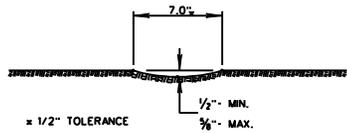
DETAIL OF SAWING AND SEALING TRANSVERSE JOINTS
